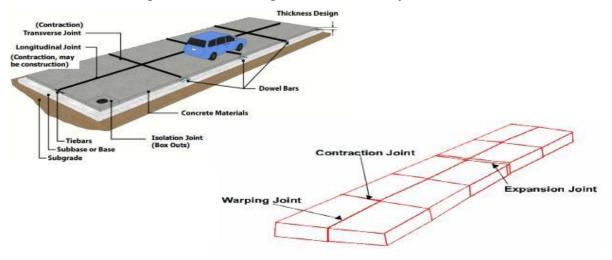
illustrates the precise placement of joints inside a cement concrete pavement.
